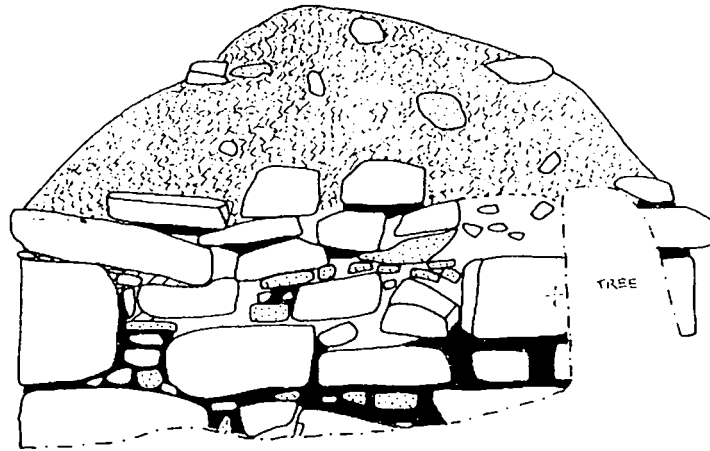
Exterior north-west elevation of Trelill Holy Well (by Jo Sturgess)
